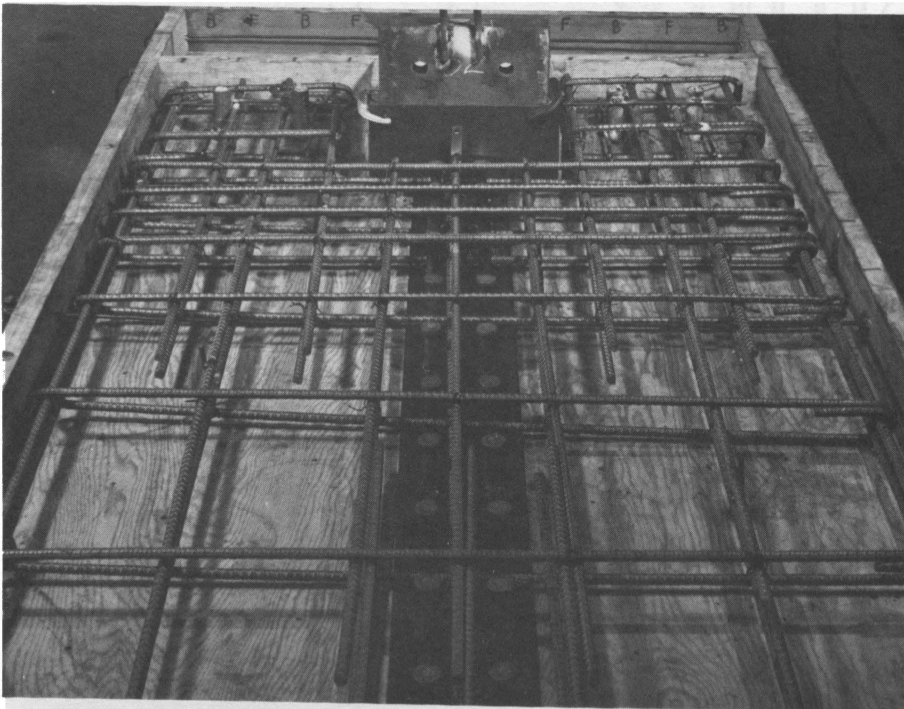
Reinforcement Detail for Beam with Shrinkage Gap
